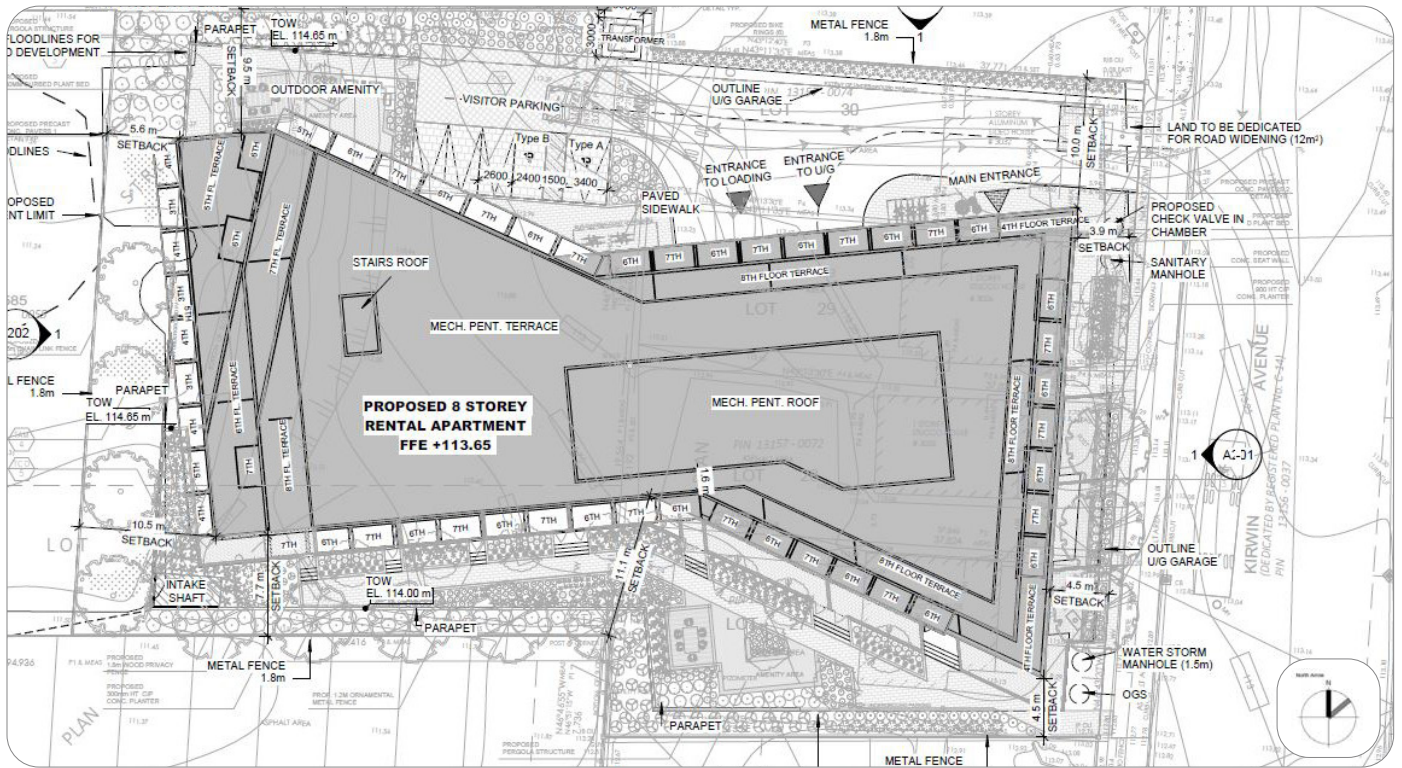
Proposed Site Plan, prepared by KFA Architects + Planners Inc.
